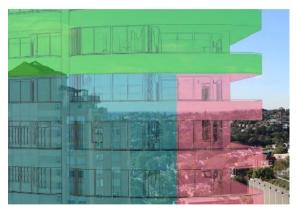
Level 11 showing photomontage indicating in pink the portion of the building that is non-compliant with the WDCP 6m tower setback control and in green the portion of the building that exceeds the LEP height standard
